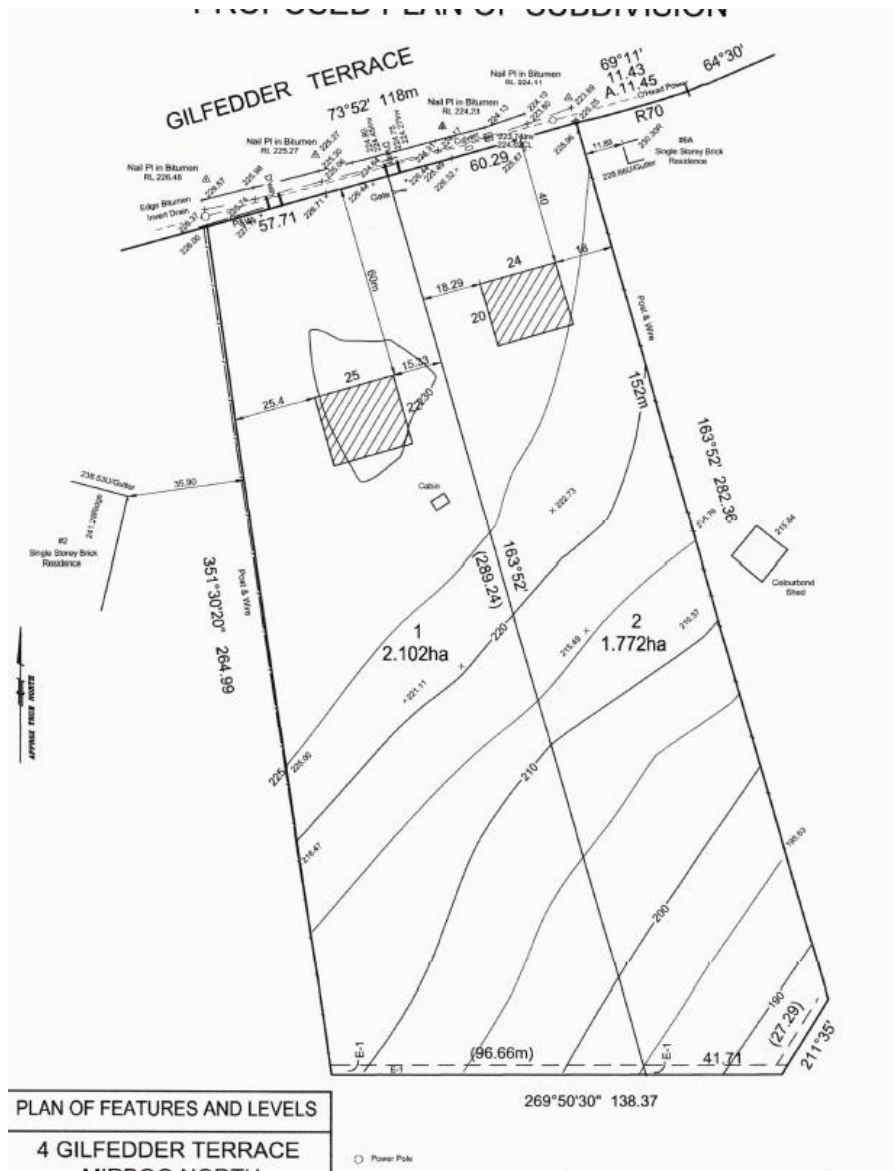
Feature plan showing the proposed subdivision. Source: Application Documents.
